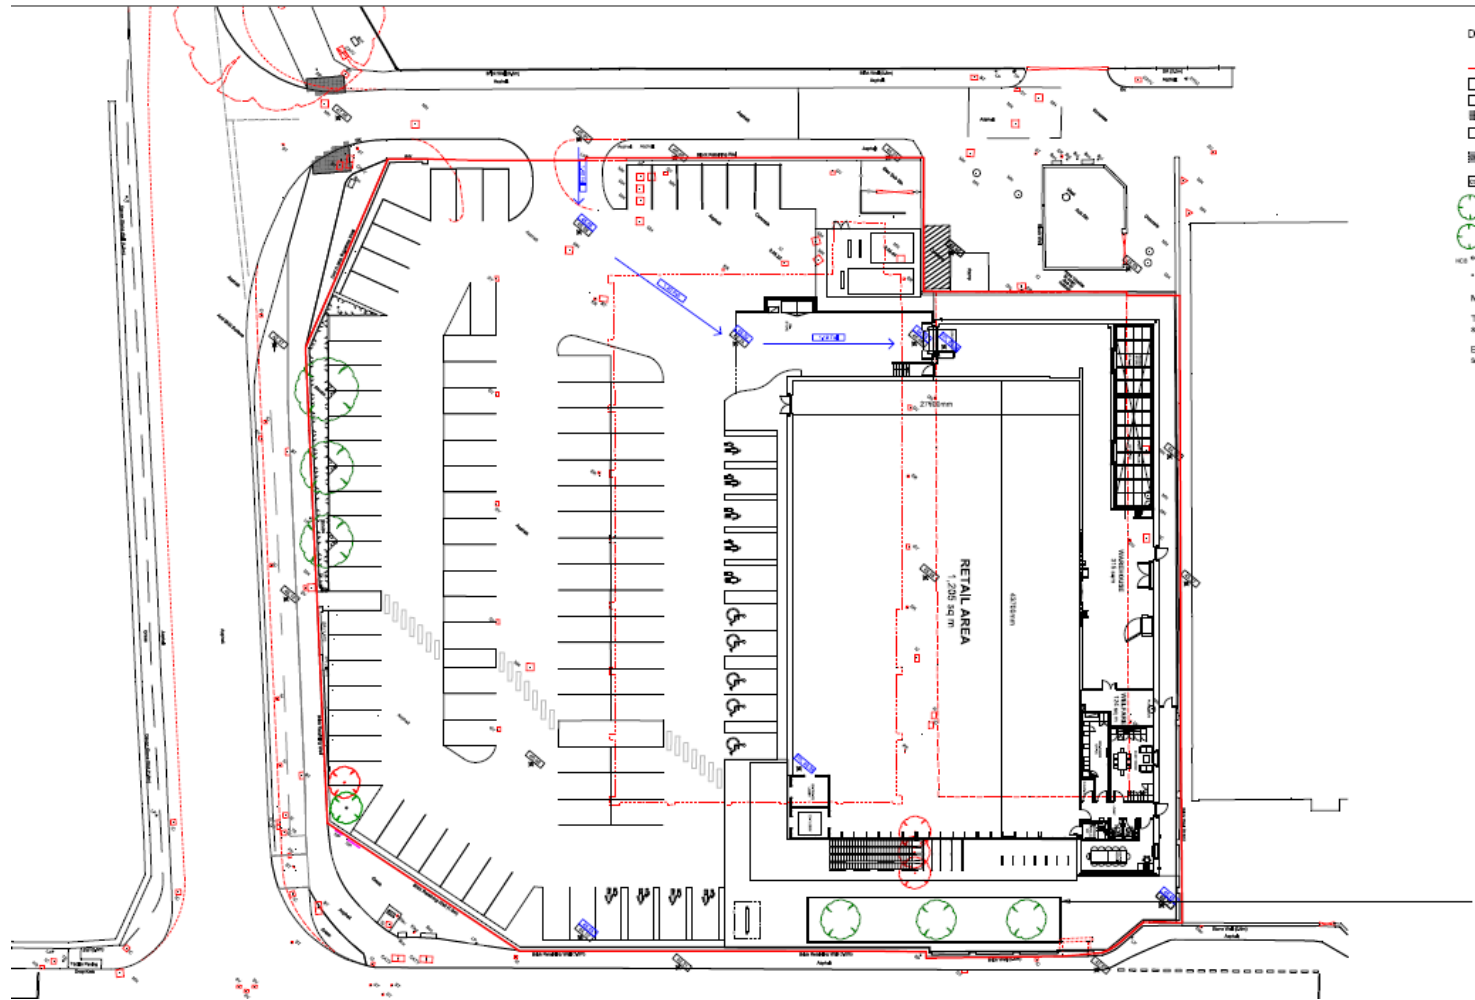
Proposed Site Layout (prepared by Kendall Kingscott Architects Ltd.)
